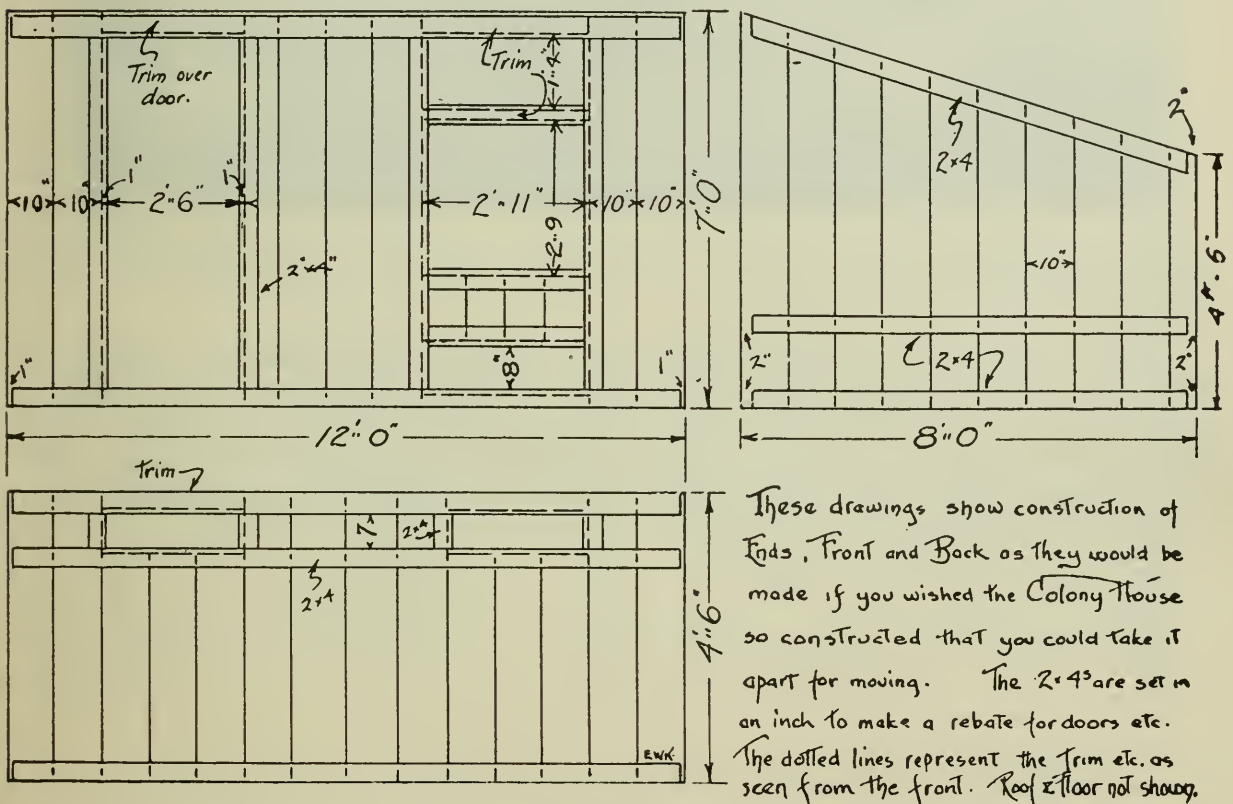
Plans showing front, end and rear wall construction where desired to have the house of the take-down type.
